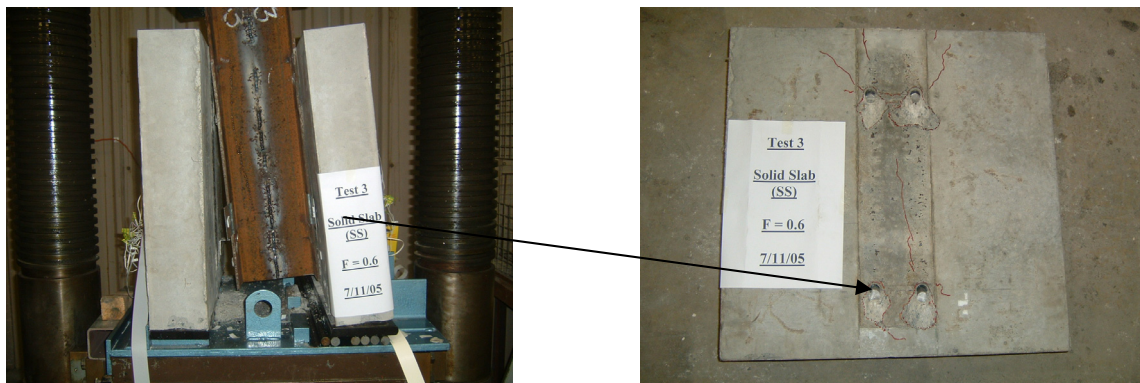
Concrete Damage at the Base of the Shear Connectors for Concrete With $F=0.6$ Fibres
